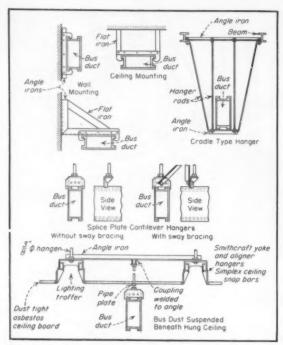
Busduct is mounted along wall and column lines, also suspended from ceilings, beams and angle bridges by means of a variety of clamps, trapeze straps, rod hangers, sway braces and welded couplings as indicated above.
